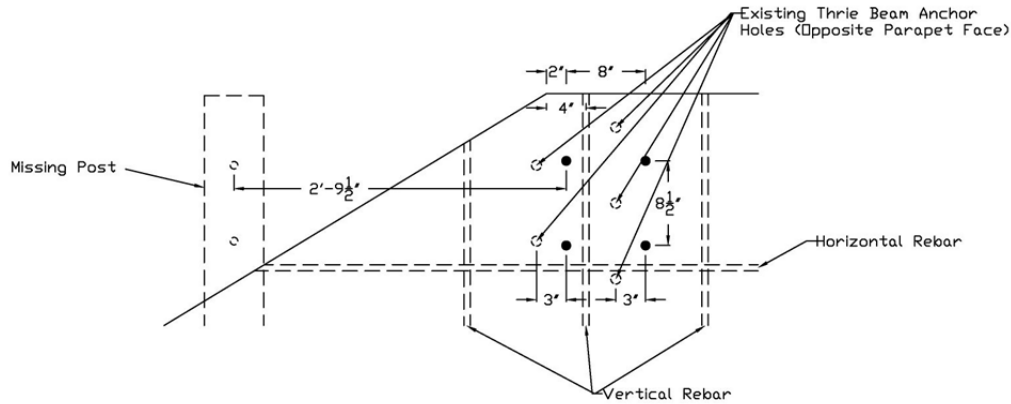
Sloped-End Parapet Retrofit – Proposed Anchor Layout
